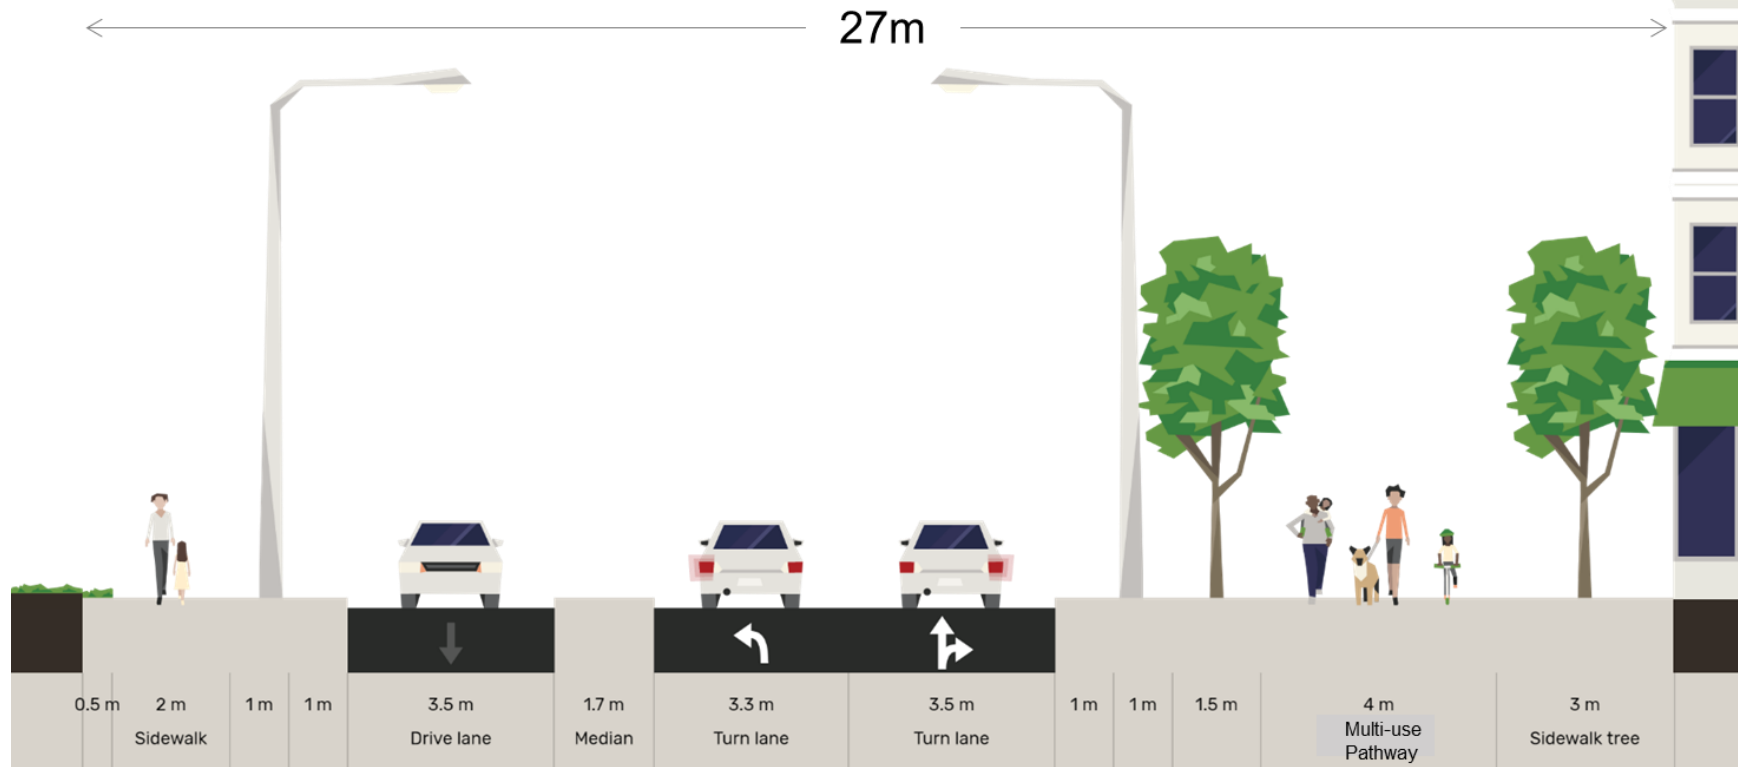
Conceptual Typical Cross Section for Bethesda Side Road, Intersection Approach with Left-Turn Lane.
